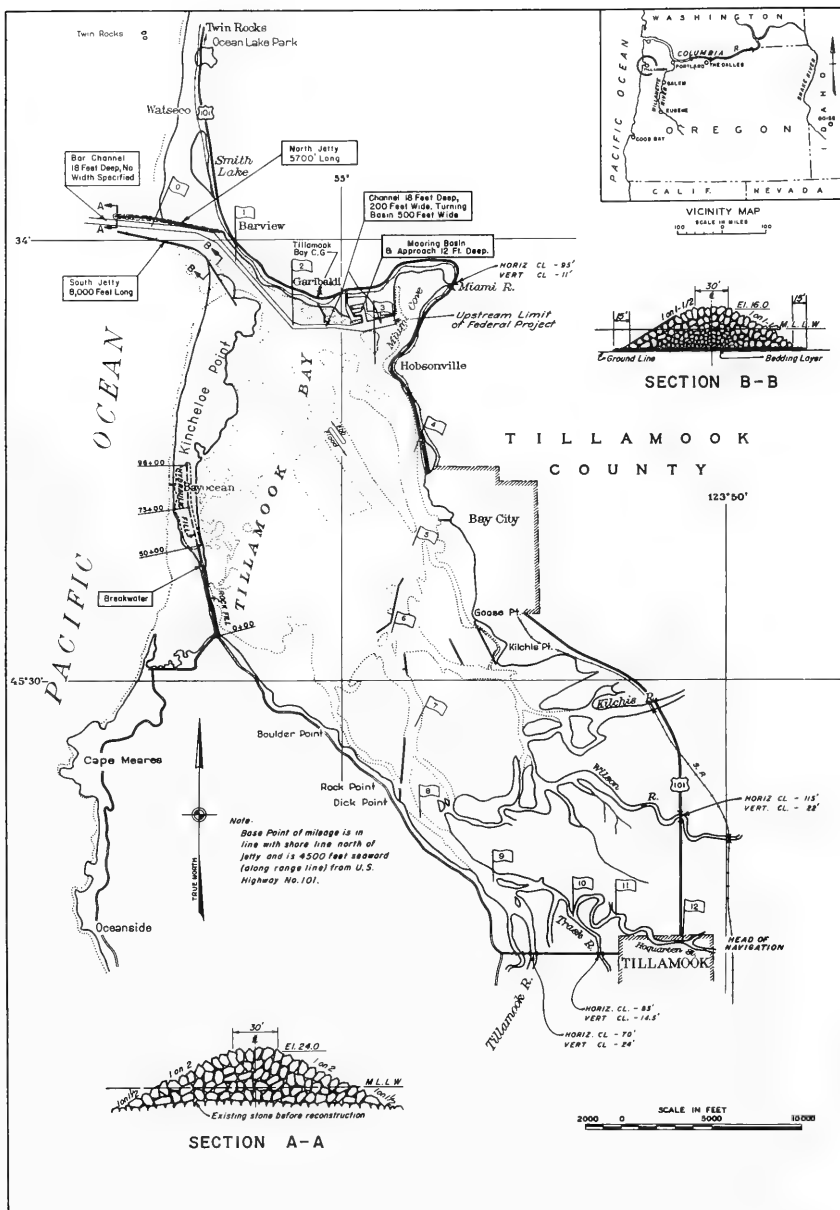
Site layout at Tillamook Bay and Bar, Oregon (revised 1979)
